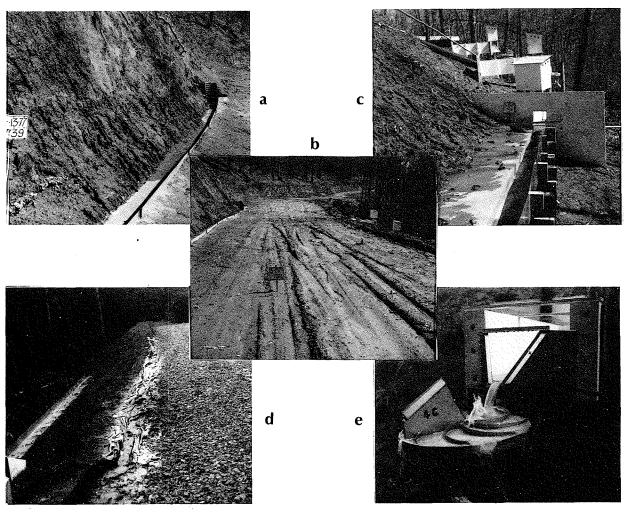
Instrumentation for soil loss measurements on roadbeds and cut and fill slopes at Coweeta Hydrologic Laboratory. (a) Bare cut slope, trough and drop inlet. (b) Bare soil roadbed in March 1977, facing downgrade toward the dip with cut slope trough on the left and berm on the right. (c) Bare fill slope, trough and headwall of flume. Sampling installations for roadbed and cut slope in the background. (d) View upslope from dip in September 1977 showing grassed fill and graveled roadbed with storm water running into drain inlet. (e) Typical 1-ft. H-flume and 2-ft. Coshocton wheel used to measure flow and extract 0.5% sample.
